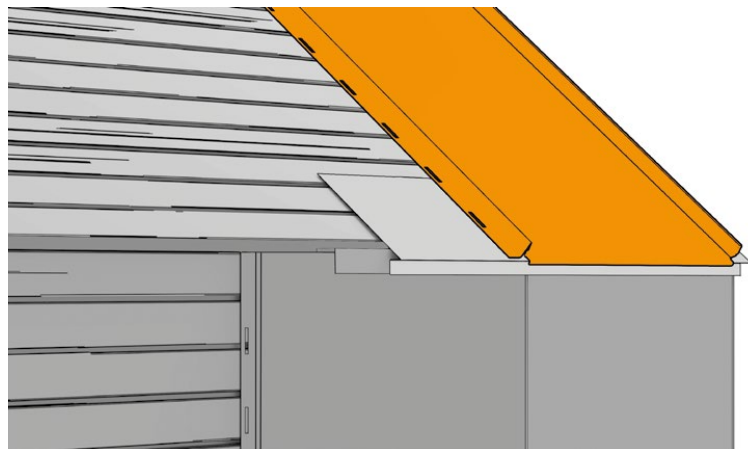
ASSEMBLY OF PANELS TO THE “J” STRIP
